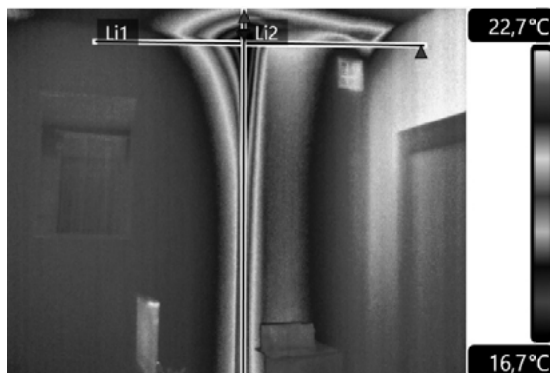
Thermogram of natural ventilation channels in the room on the top floor of the building
